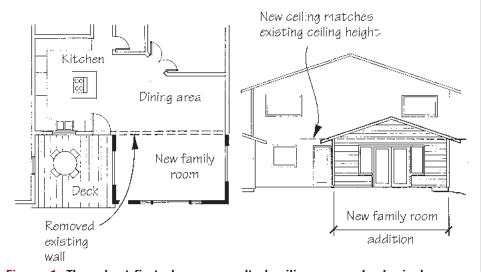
Though at first glance a vaulted ceiling seemed a logical way to open up the family room addition, using a flat ceiling there actually made the space seem more spacious by connecting it to the existing flat-ceilinged rooms.
